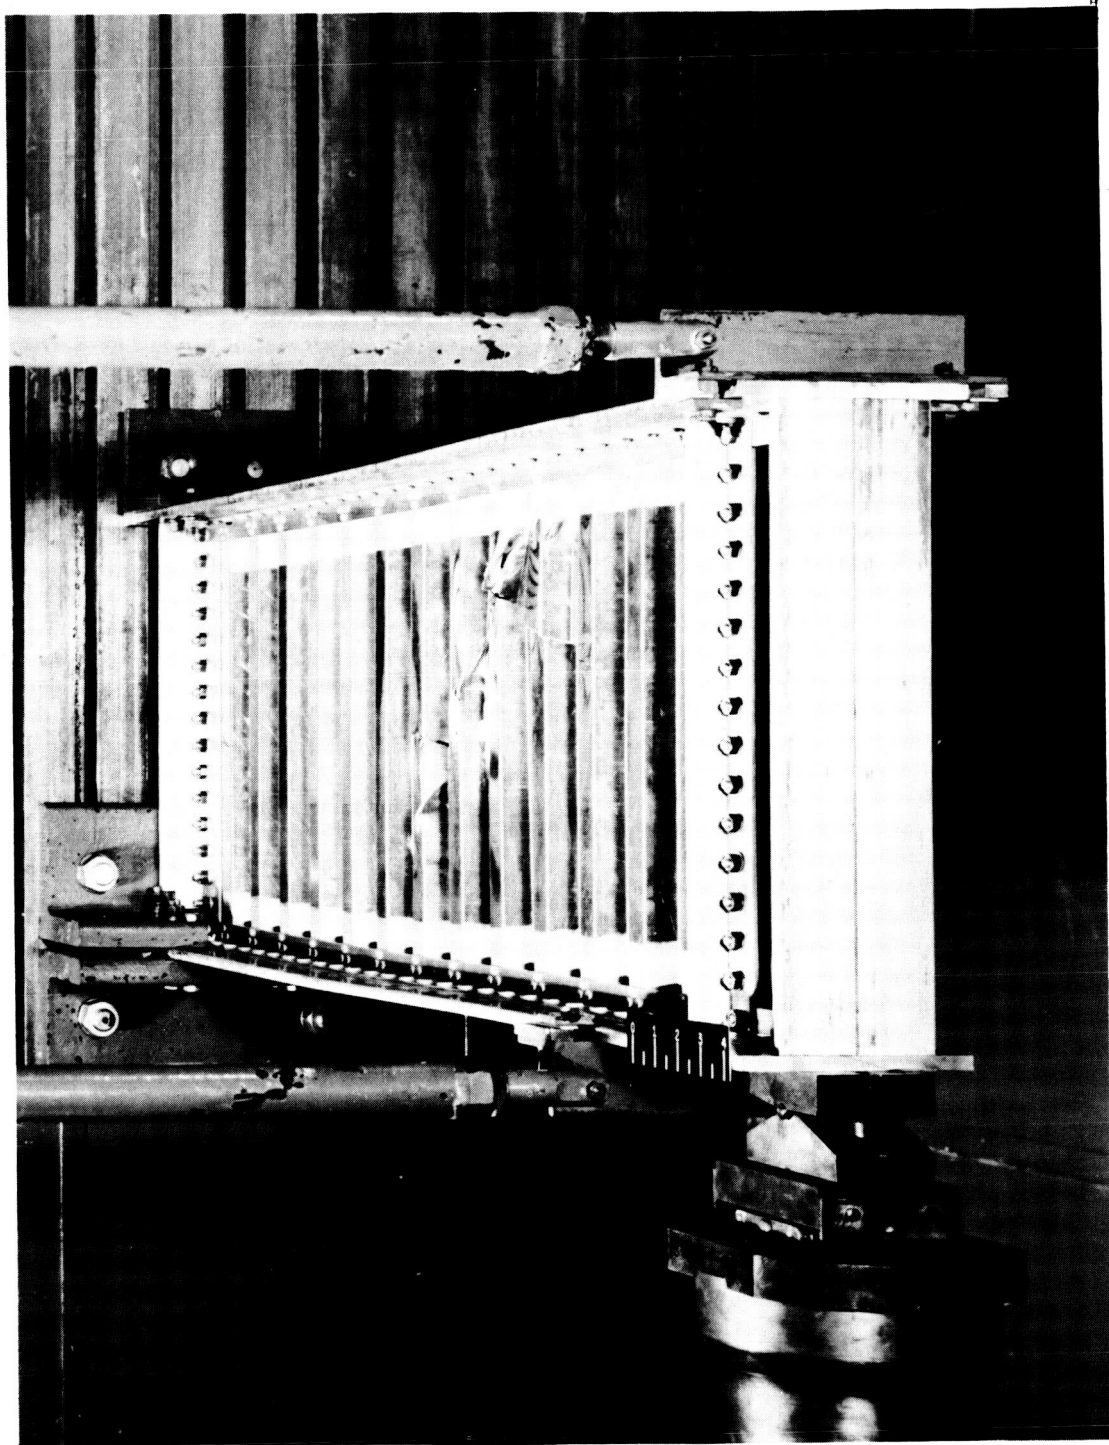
Beam 1 after testing. Horizontal guide arms shown were used to eliminate the possibility of lateral instability failures.
